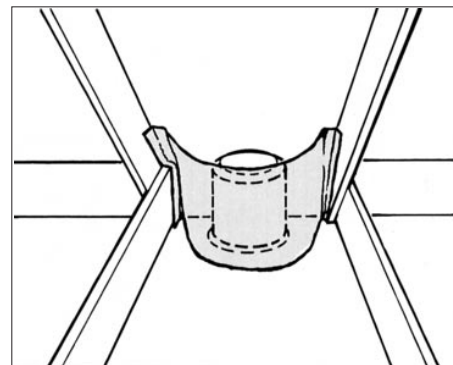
The tight spacing around recessed lights near eaves may require you to build a dam at the end of the joist bay, leaving the eaves uninsulated.
